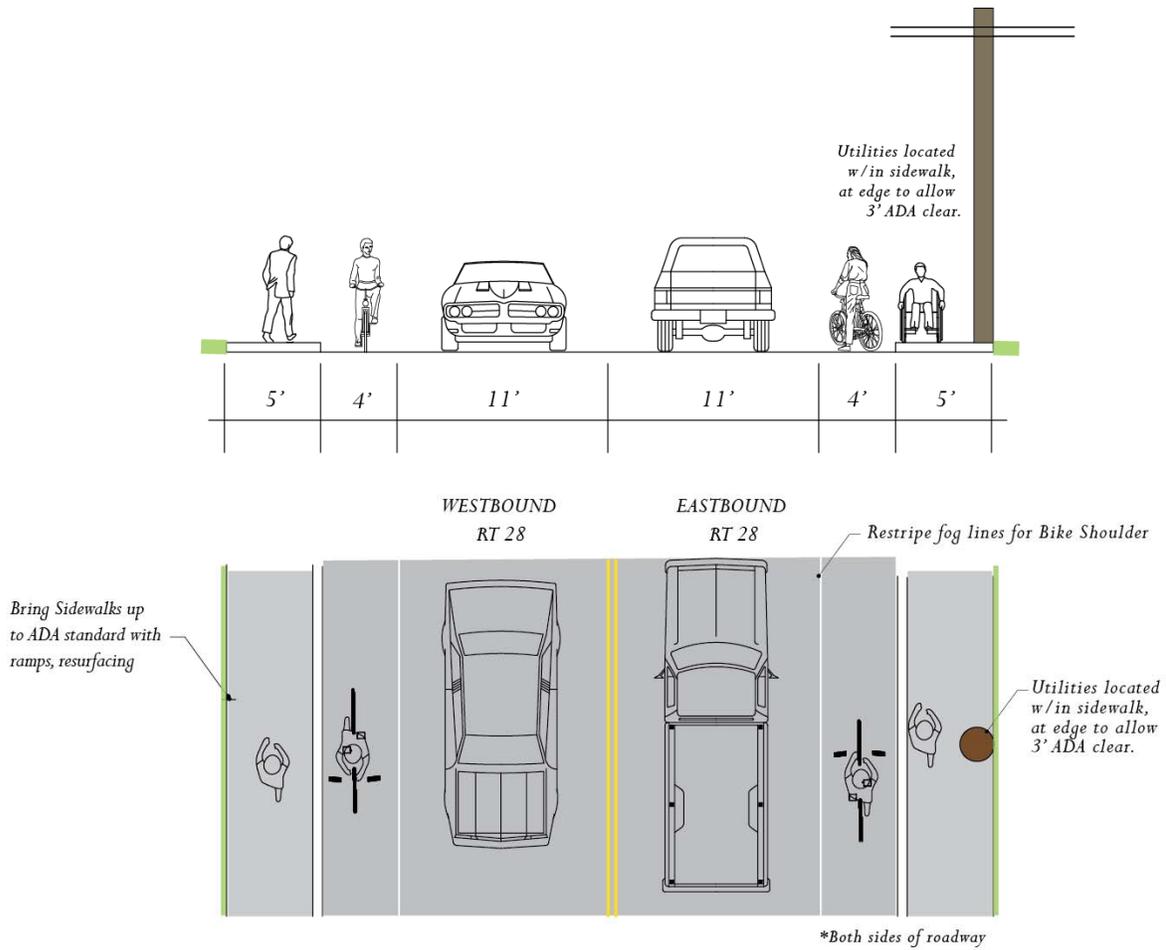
LOOKING WEST AT PROPOSED 40' LAYOUT
